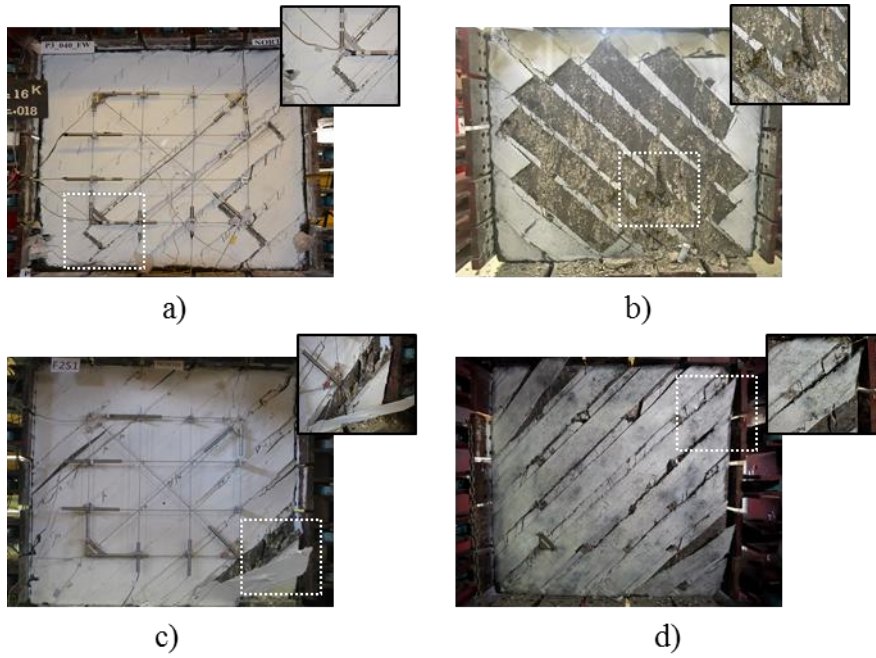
Different failure modes of panel specimens, a) FRP debonding, b) Concrete crushing, c) FRP anchor failure, d) FRP rupture
